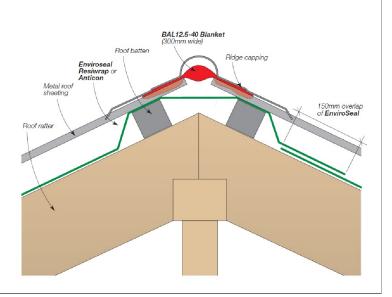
Hip/Ridge Detail - Steel Roof (BAL-12.5 - BAL-40)
